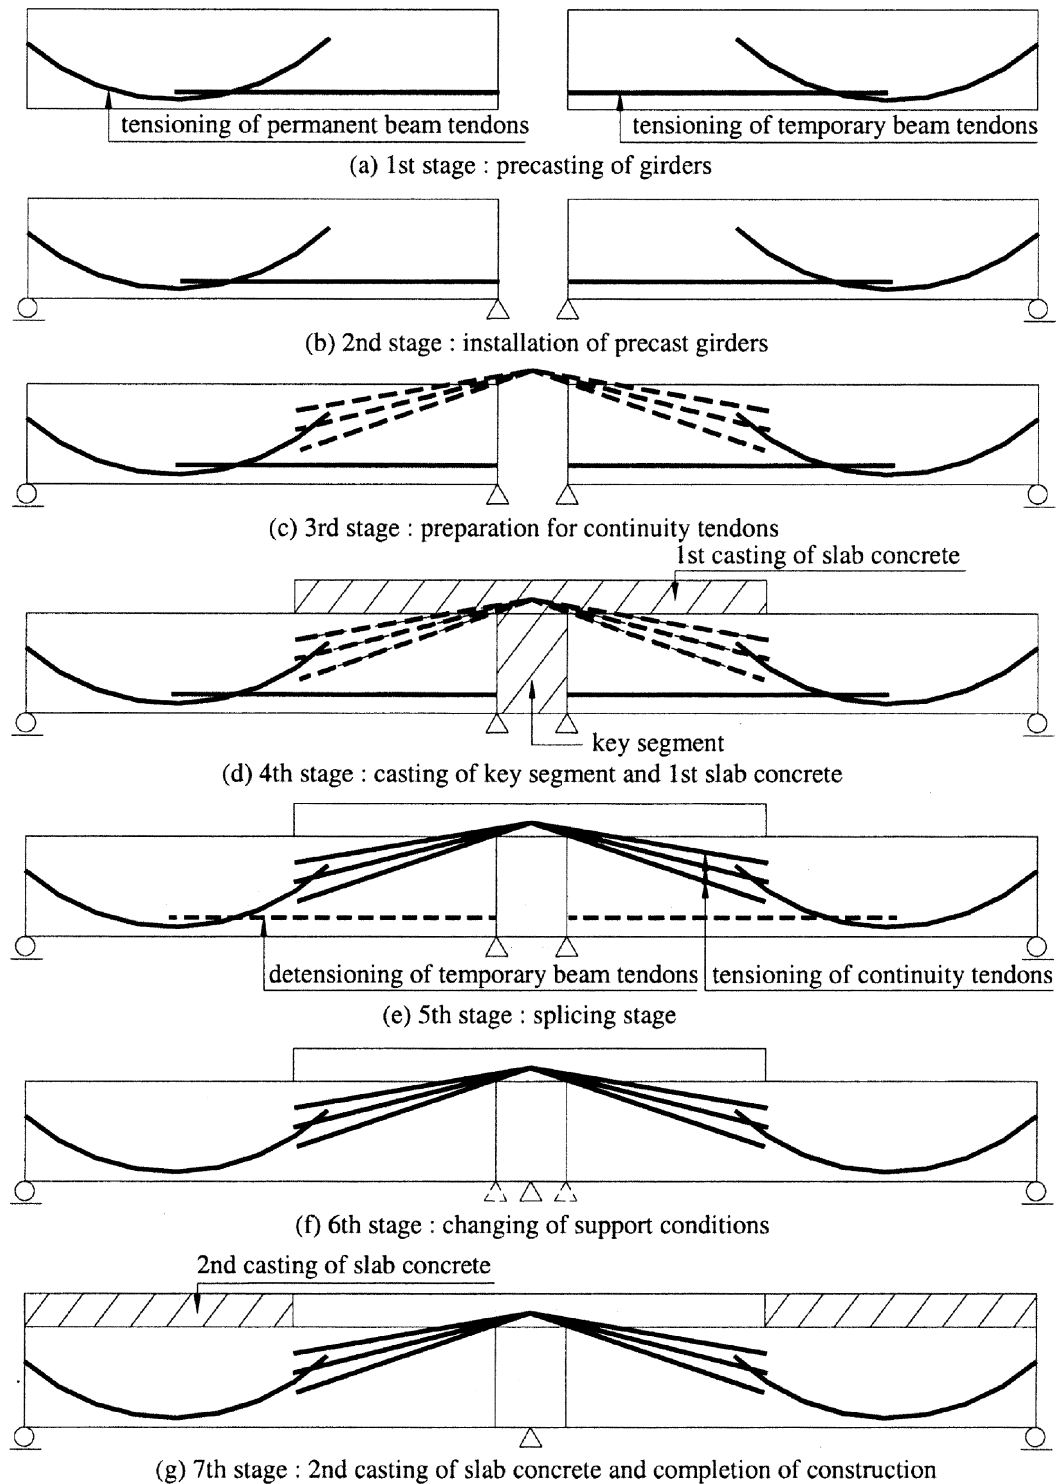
Splicing process for two simply supported U-shaped prestressed girders
